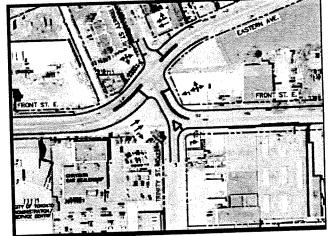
Alternative 2 realigns the intersection such that Front Street and Eastern Avenue form a single east-west road.
